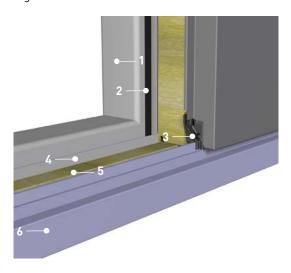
Window frame levelled with the surface of the Qbiss One B façade elements, assembled in shifted joint
